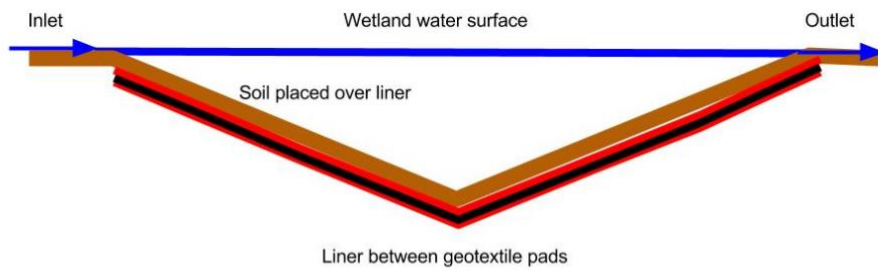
Typical profile view showing installation of the aquatic-safe liner and geotextile
